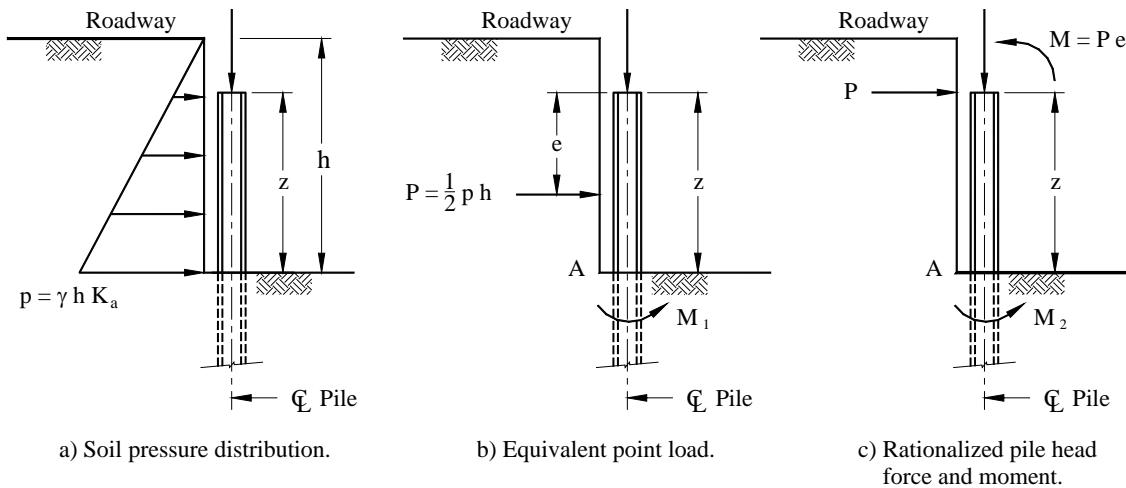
Resolving a lateral pile loading to an equivalent pile head point load and moment.
